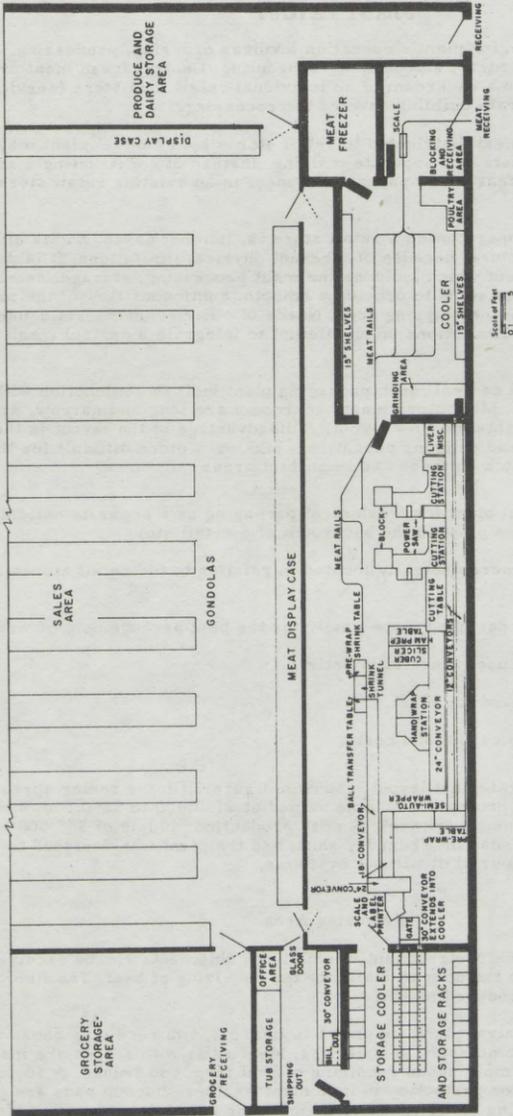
A small-volume central meat-packaging plant built in conjunction with a retail store.
